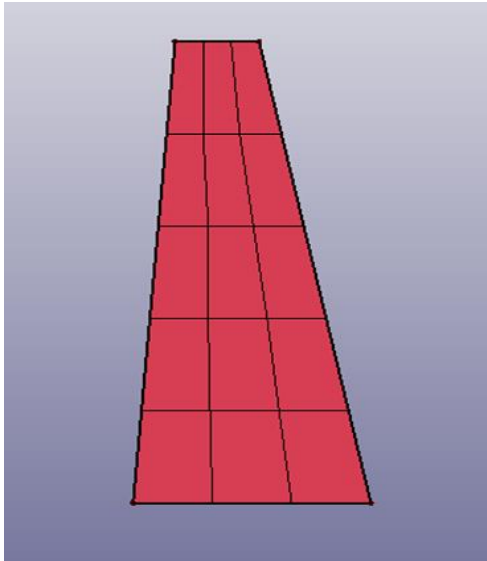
Cross-Section View of 42-in (1067 mm) Barrier
